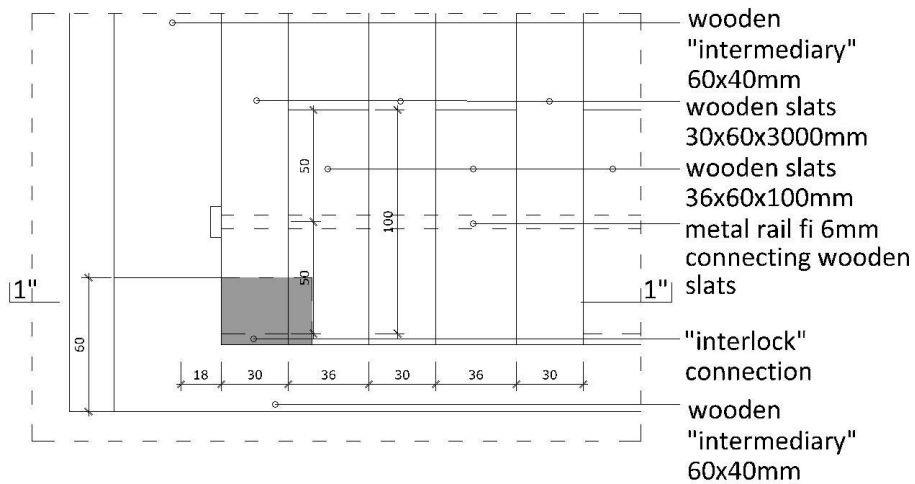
Details and sections of the GDC external wall boxes. (source: 4D architects).
